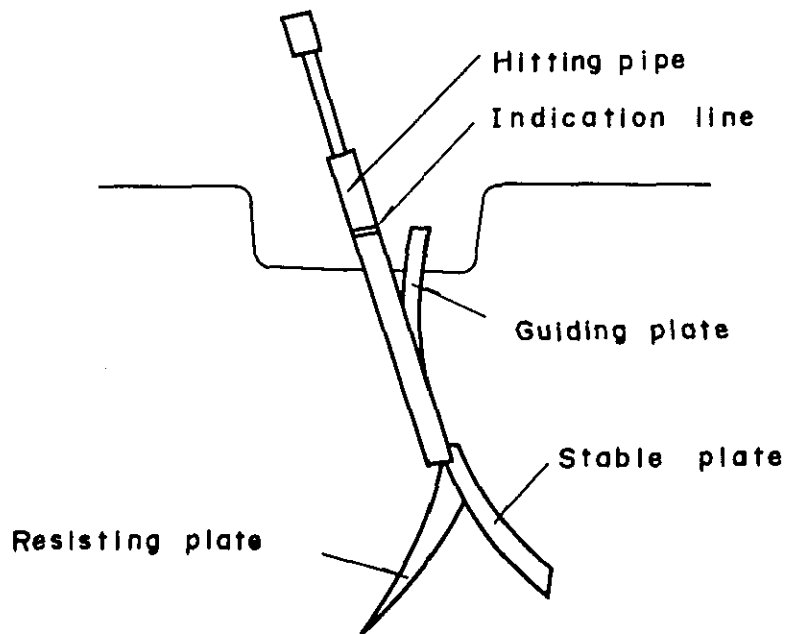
Installation of Stay Anchor (3/4)
